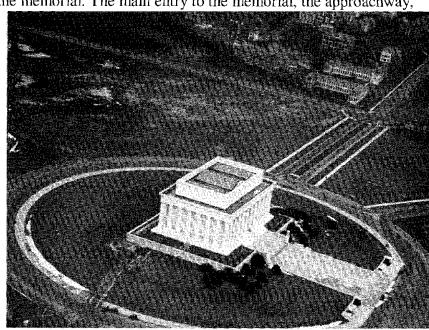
Initial sidewalk installation, February 13, 1922. U.S. Navy photo, MRC 1-61.
